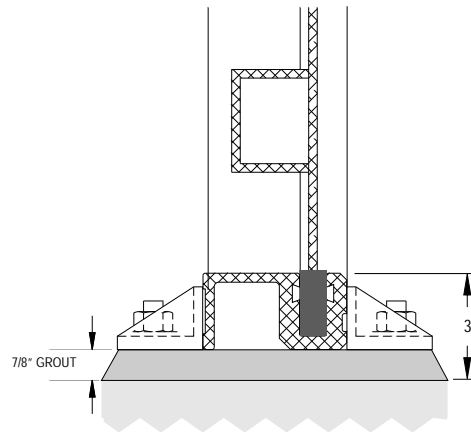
761- Aluminum Flat Frame Mounting; Section BB
